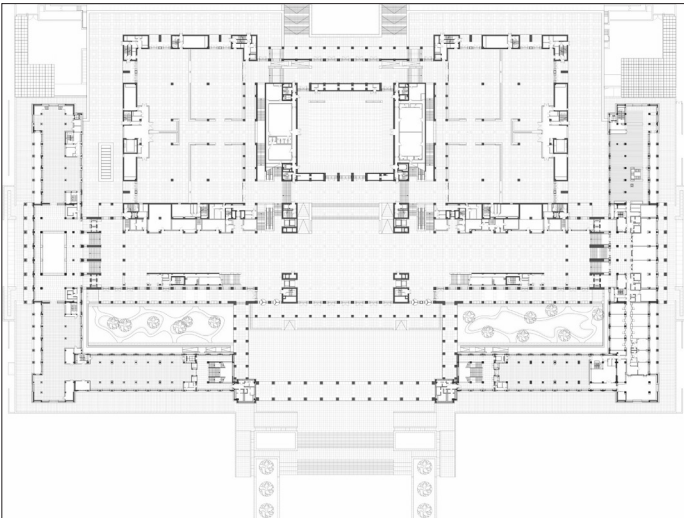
Floor plan (entrance level) of the reconstructed building of 2011, courtesy of gmp 2011
